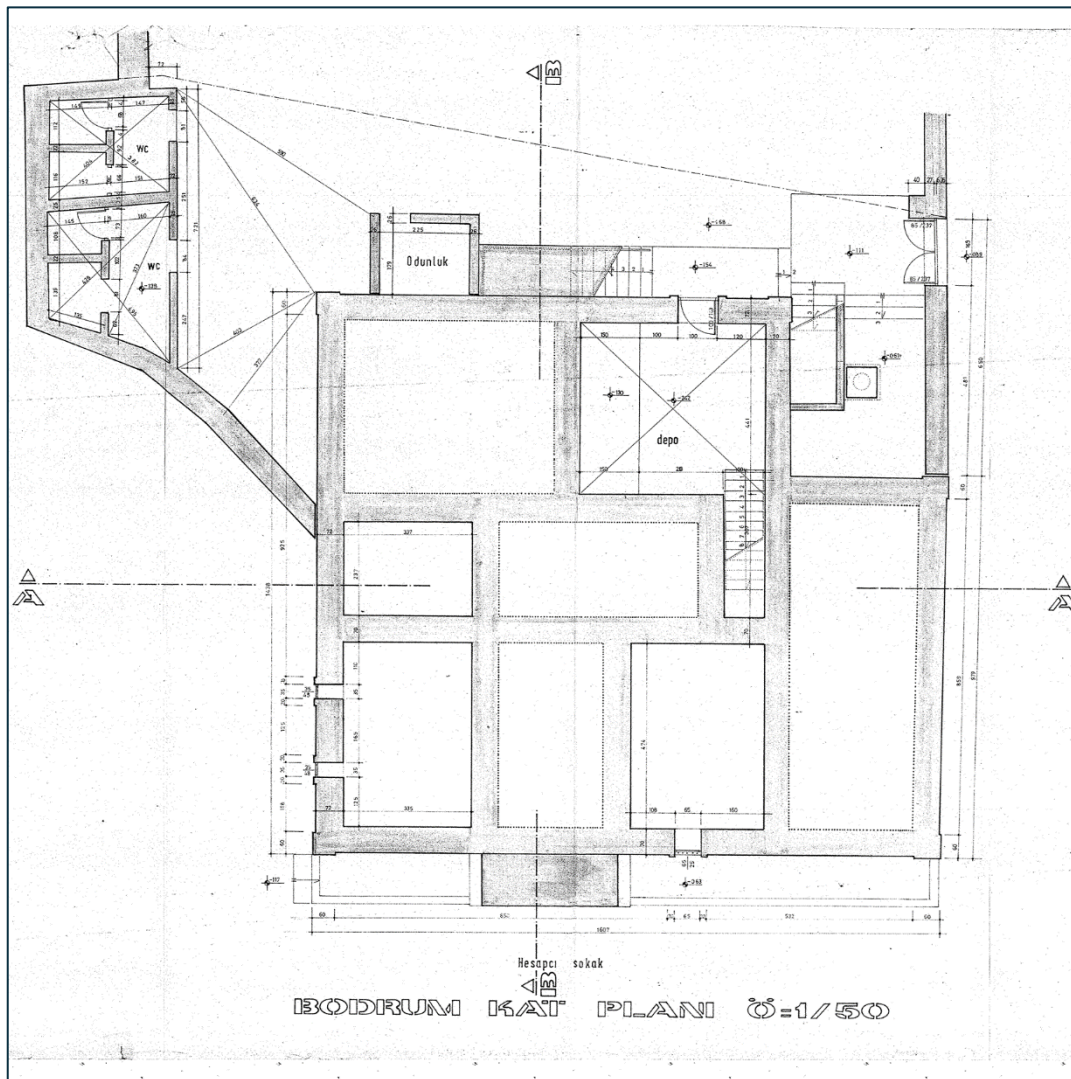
Original plan of the basement of Building B. Retrieved from the official documentation drawings of Building B.
